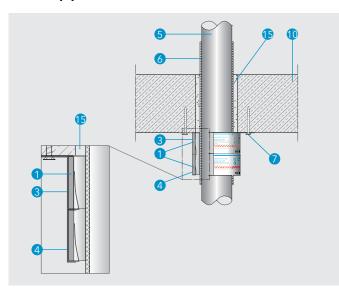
Detail E - PROMASTOP®-FC MD penetration seal in rigid wall for pipes without insulation (Ø > 125 mm)
